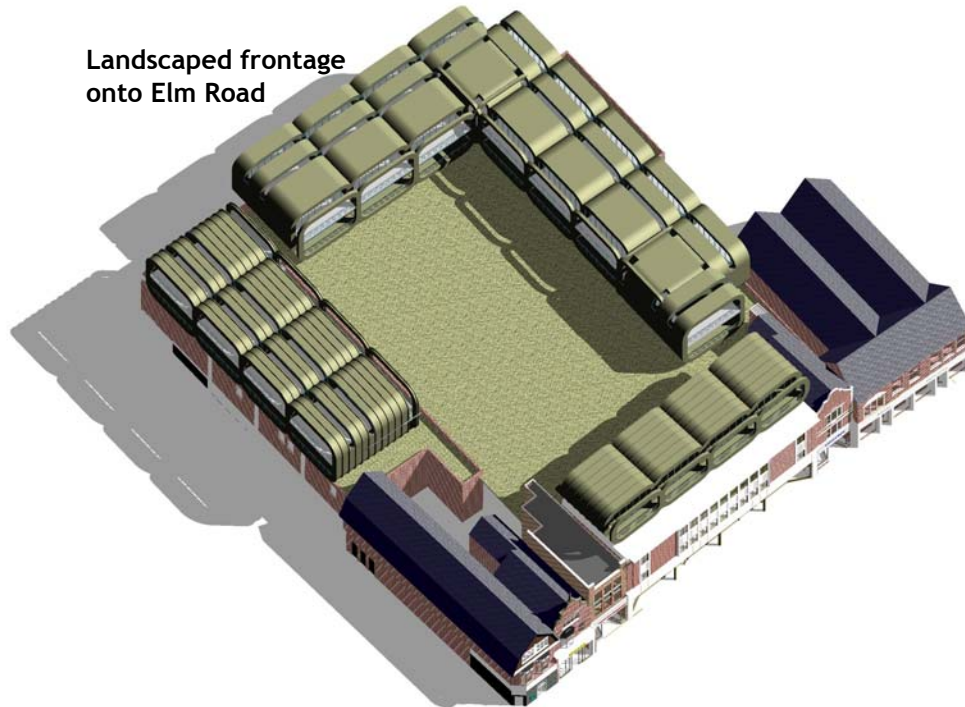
OPTION B – Indicative Layout of development over roof space of Job Centre & M&S
